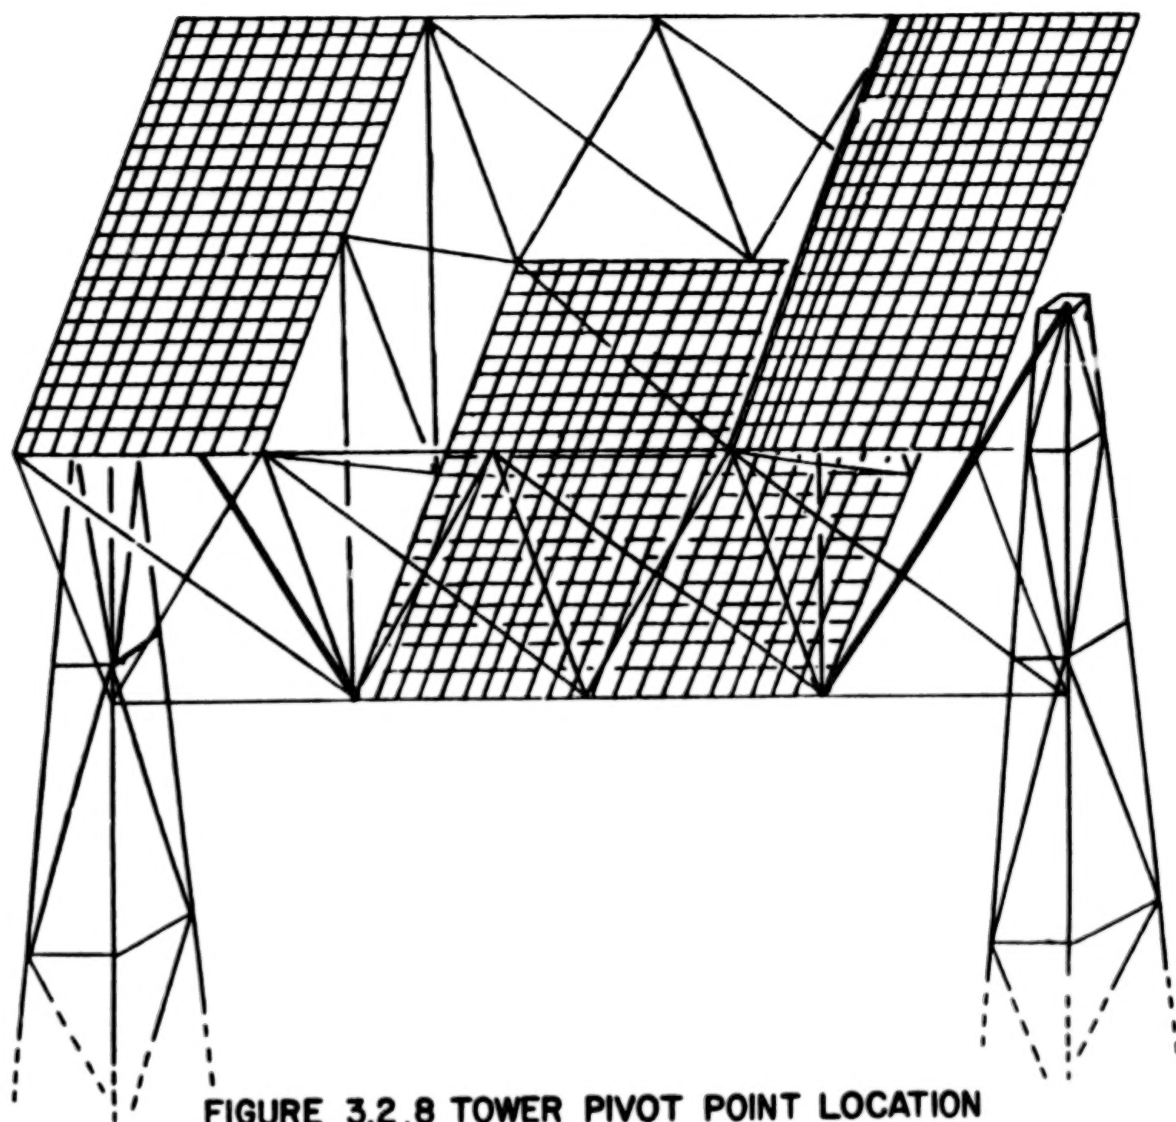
TOWER PIVOT POINT LOCATION
